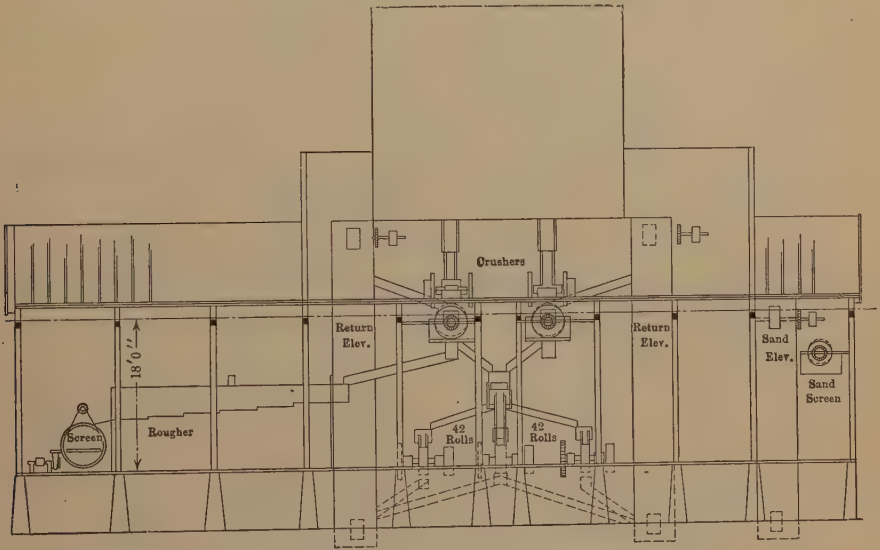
LONGITUDINAL ELEVATION OF MEDIA MILL.
